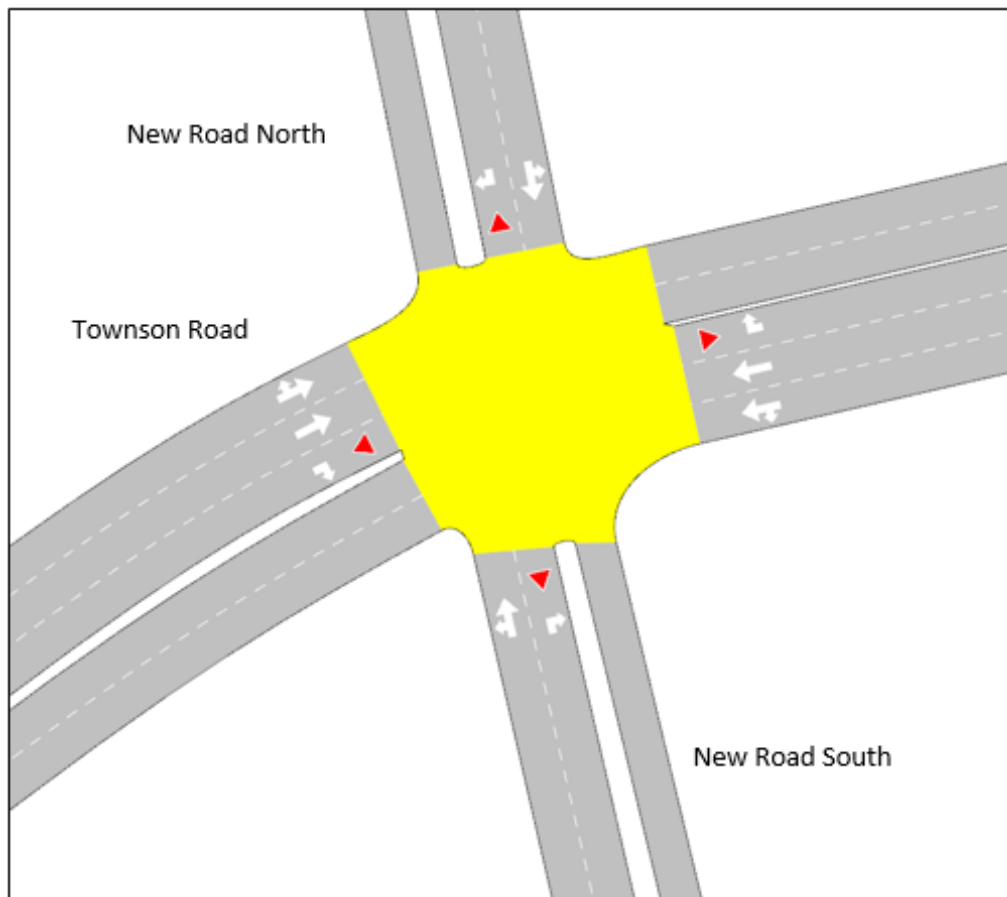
Modelled intersection layout at Townson Road and New Road
